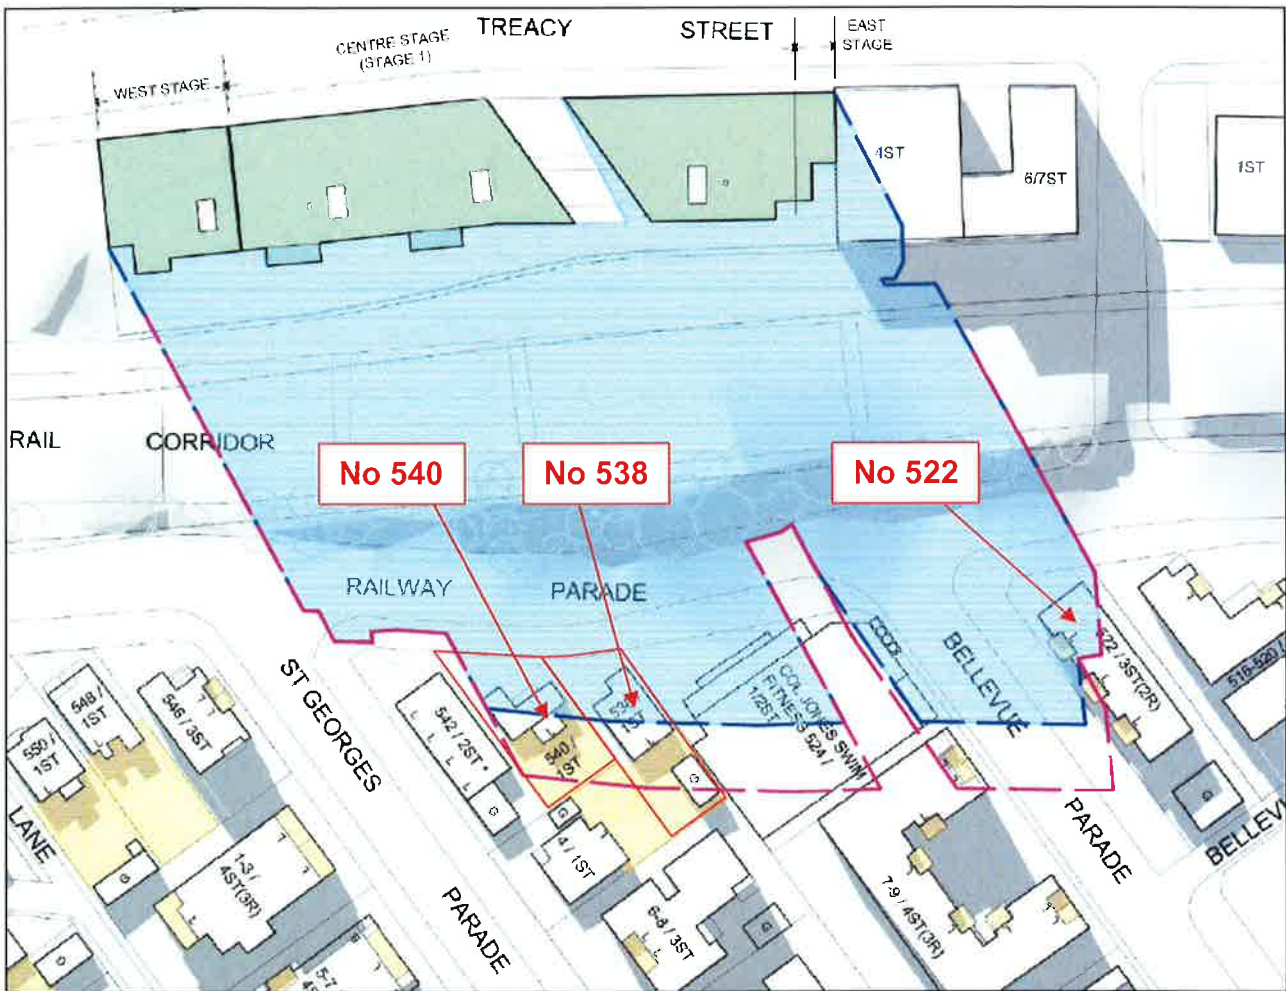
Shadows at 1pm mid-winter (source Proponent's EA)
